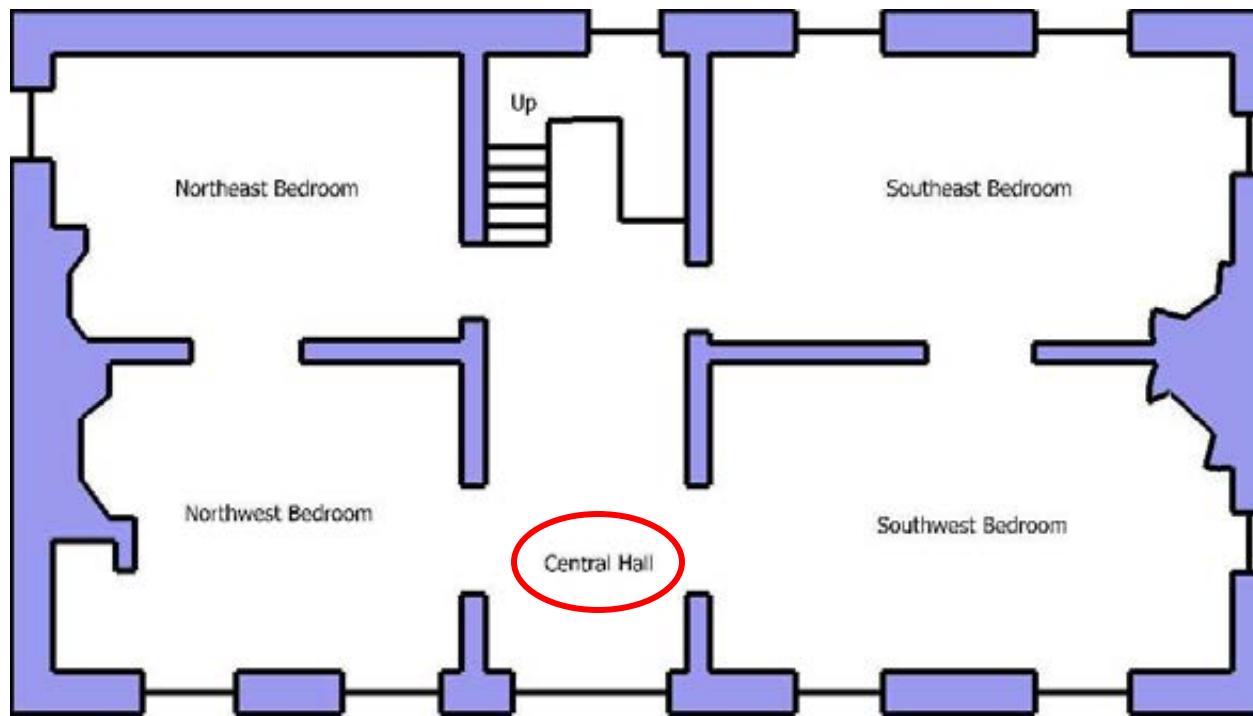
Plan of Bostwick's second floor showing the center hall. Drawing by Kathleen Manicke.
